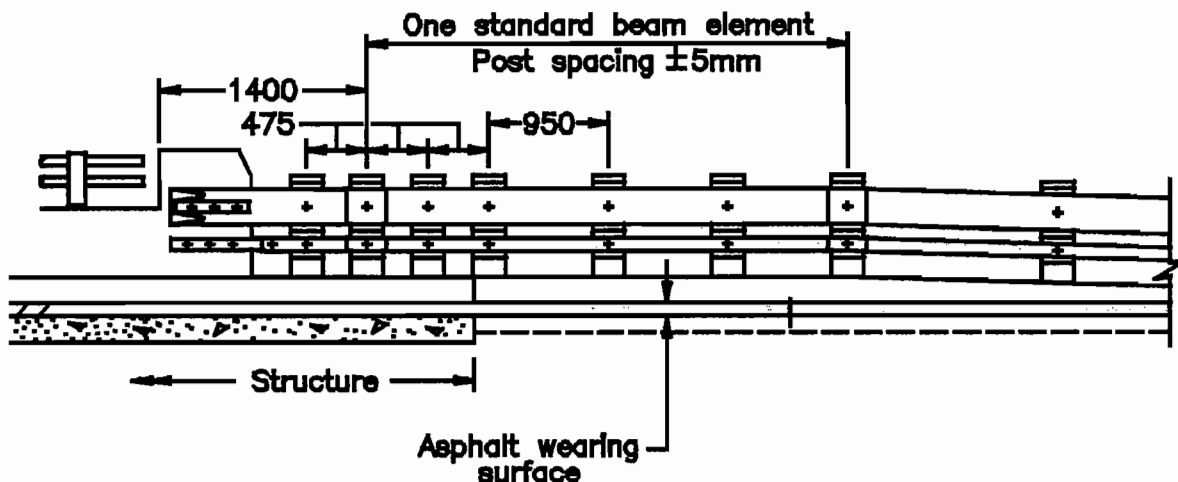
Typical Connection to Structure - Steel Beam
